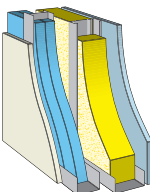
HEAD NOGGING DETAIL FOR RONDO C-STUD WALLS
